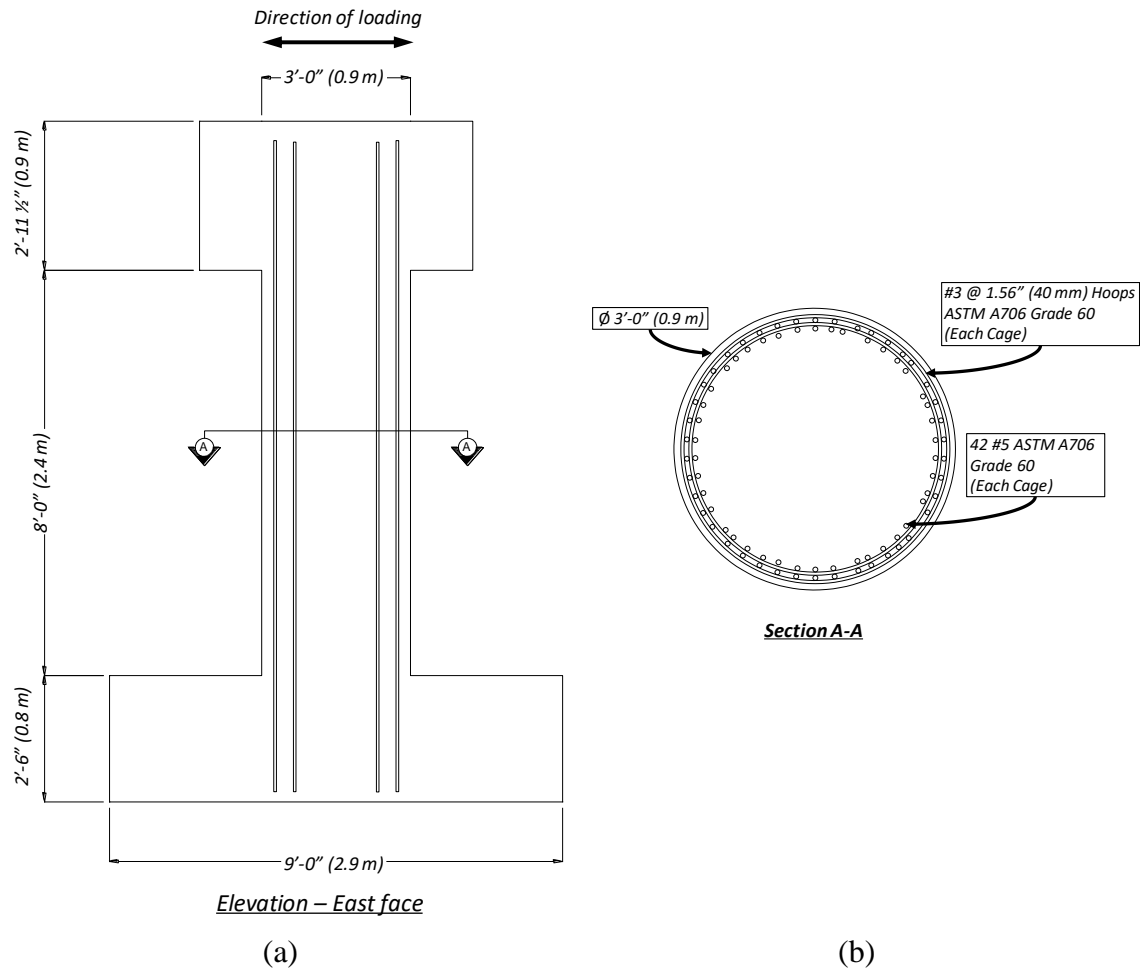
Unit 1 Test Specimen from Stephan et al.; (a) Overall Dimensions; (b) Column Reinforcement Layout
